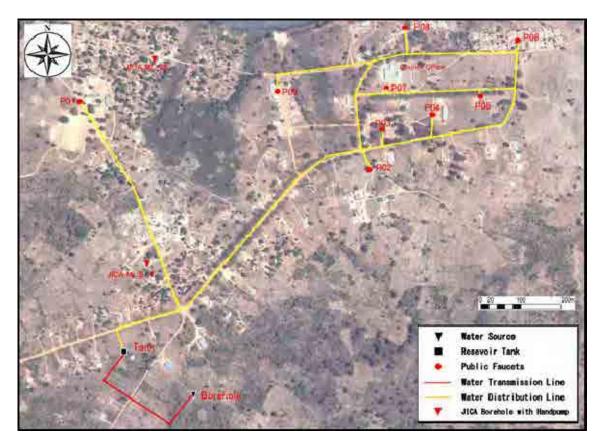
Facilities Layout Plan for Milenge in Milenge District
